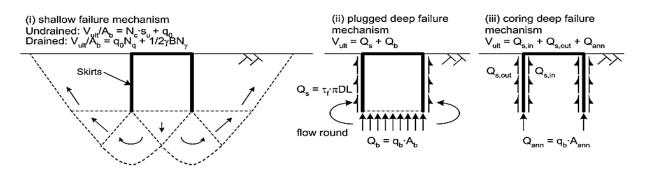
Failure mechanisms for vertical compression loading of skirted foundations/suction caissons (Schneider and Senders, 2010).
